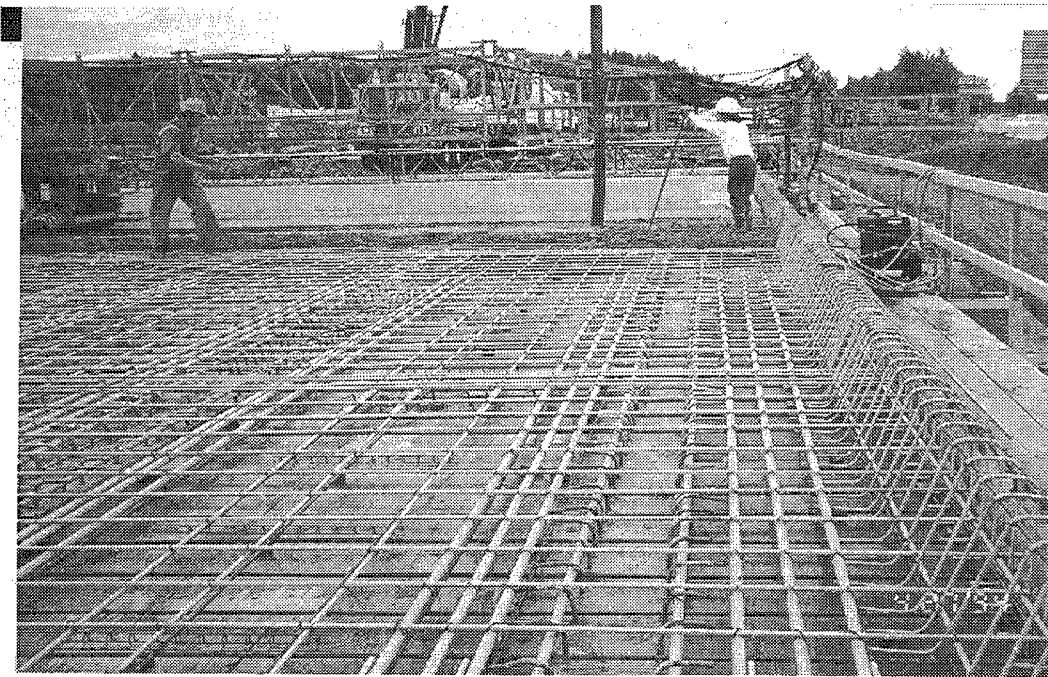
The deck of Santiam Overflow No. 4 was placed in April 1994. Note the isotropic layout of the rebar.
